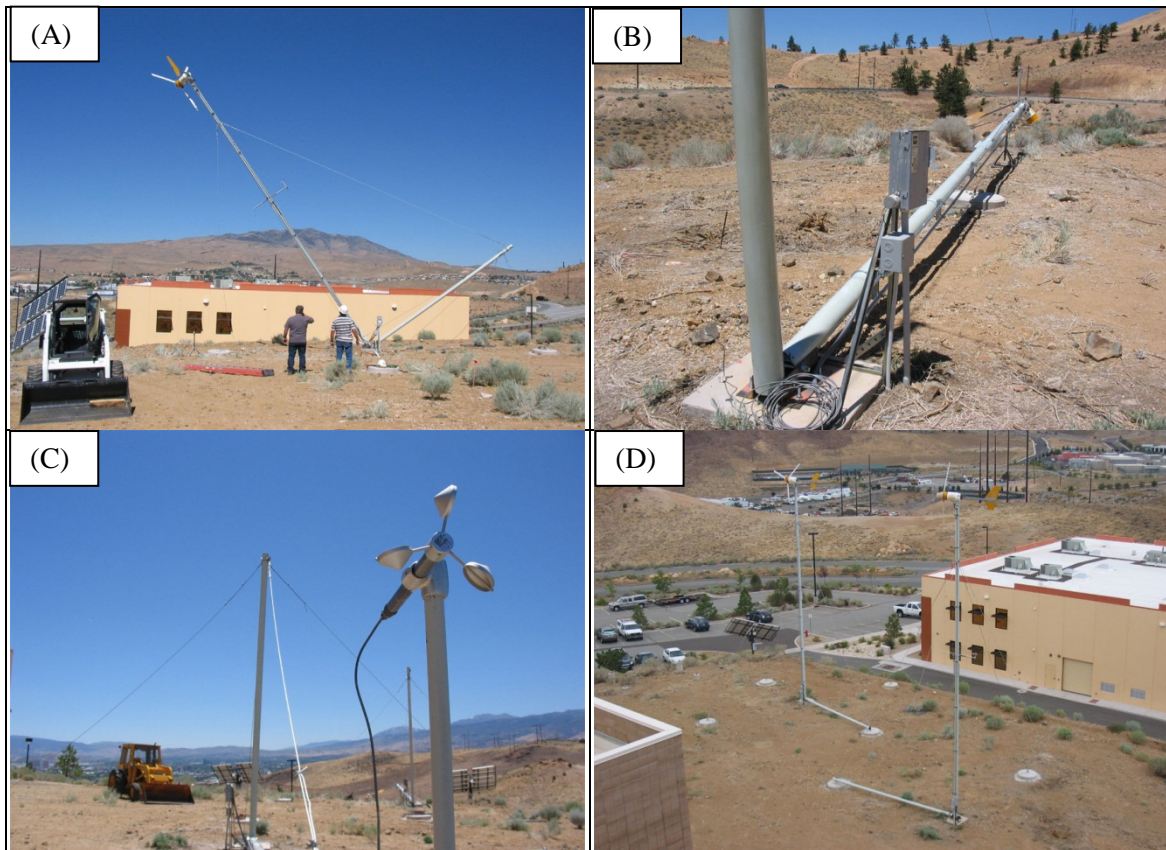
Erection of Bergey wind turbines on new, 20-m towers. (A) tilt-up tower, (B) base of tower, (C) instrument arm on tower, (D) fully installed turbines.
